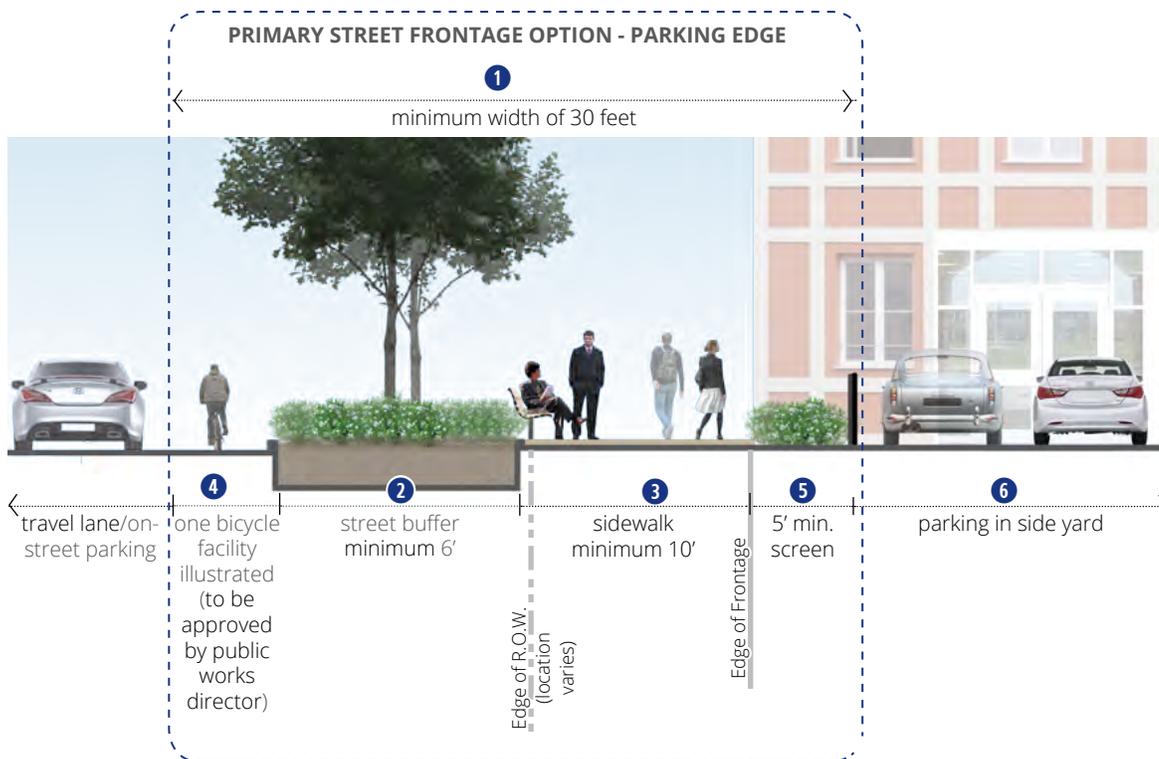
Primary Street Frontage Option - Parking Edge
